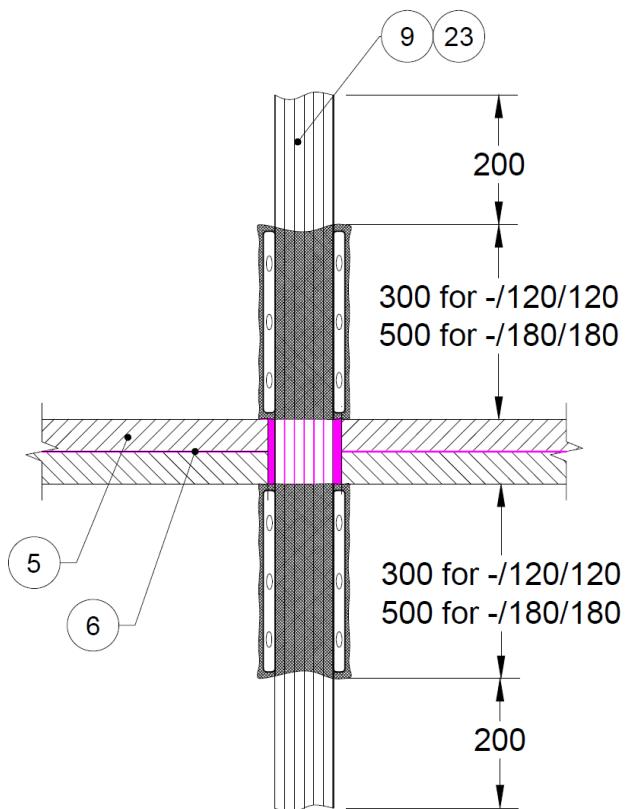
Section View of D1 and D2 Cables with/without Cable Trays in TBA Firefly™ Intubatt not against Wall Construction in Horizontal Substrates – Wrapping on Topside
